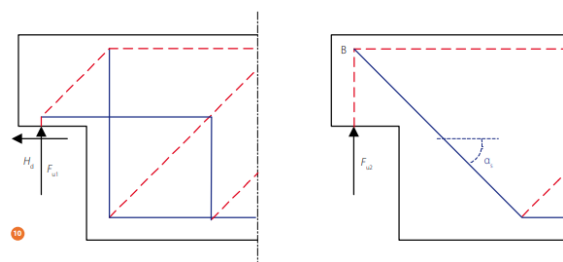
Strut and tie models to design the reinforcement in a tooth joint (Wijte et al., 2010)
